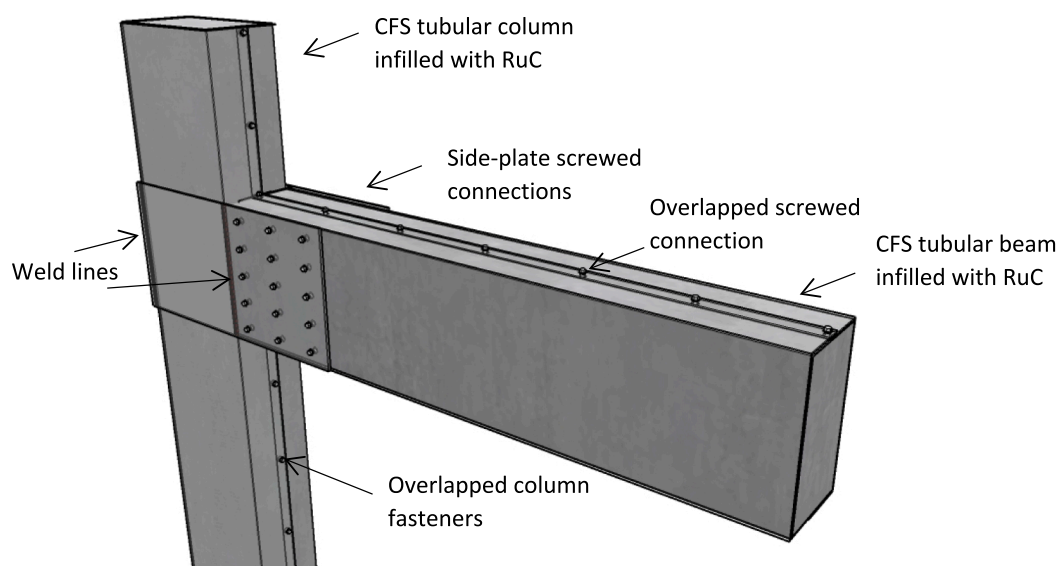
Schematic view of the developed composite cold-formed steel (CFS)- rubberised concrete (RuC) moment-resisting screwed connection.
